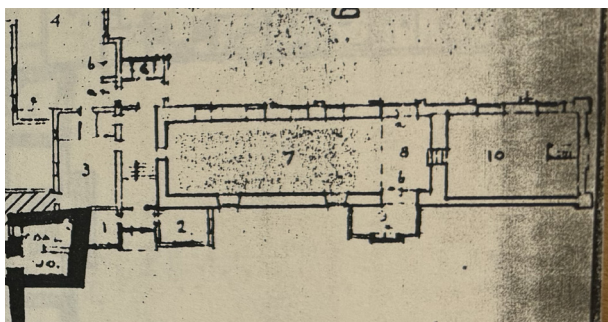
Ground floor plan of Jesuit Retreat (undated)
